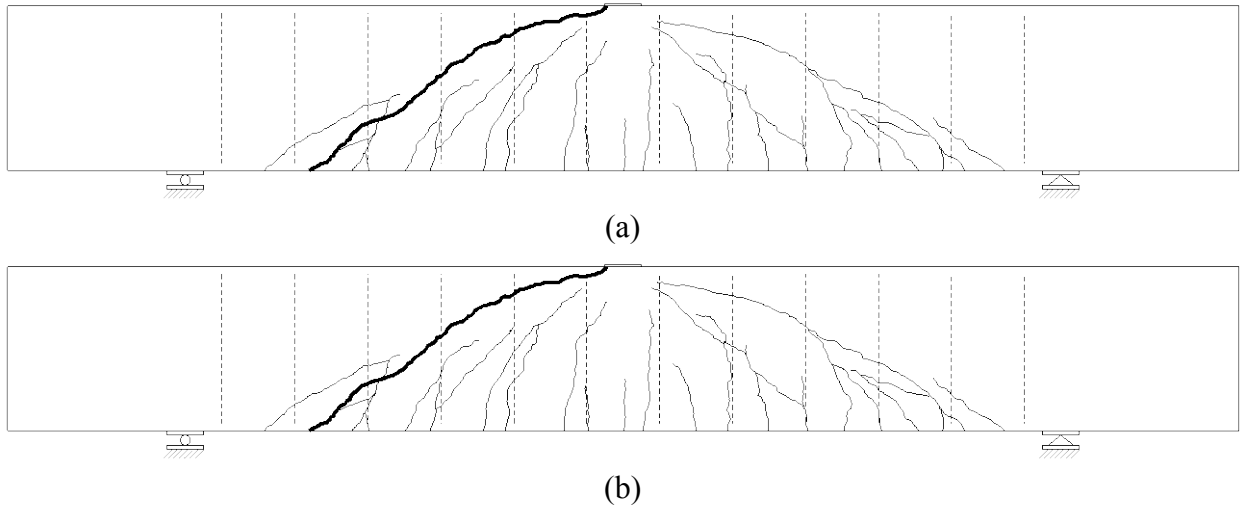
Observed damage in specimen P3S5, (a) front side, (b) back side
